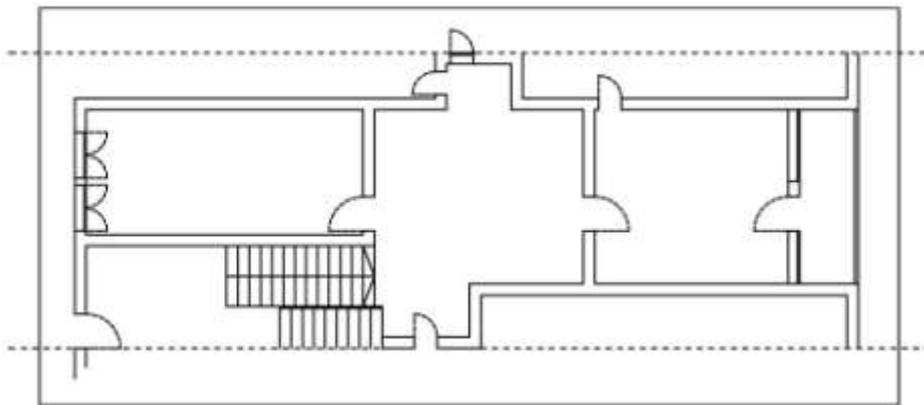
Second floor plan of the house at 77 lot 30 parcel
